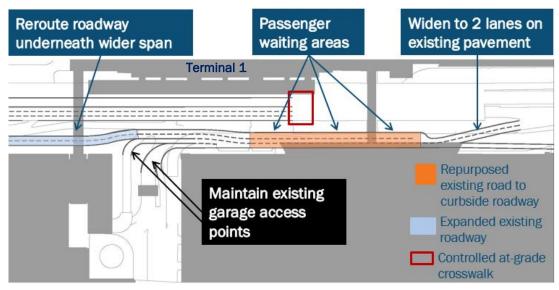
Supplemental Arrivals Curb Alternative
